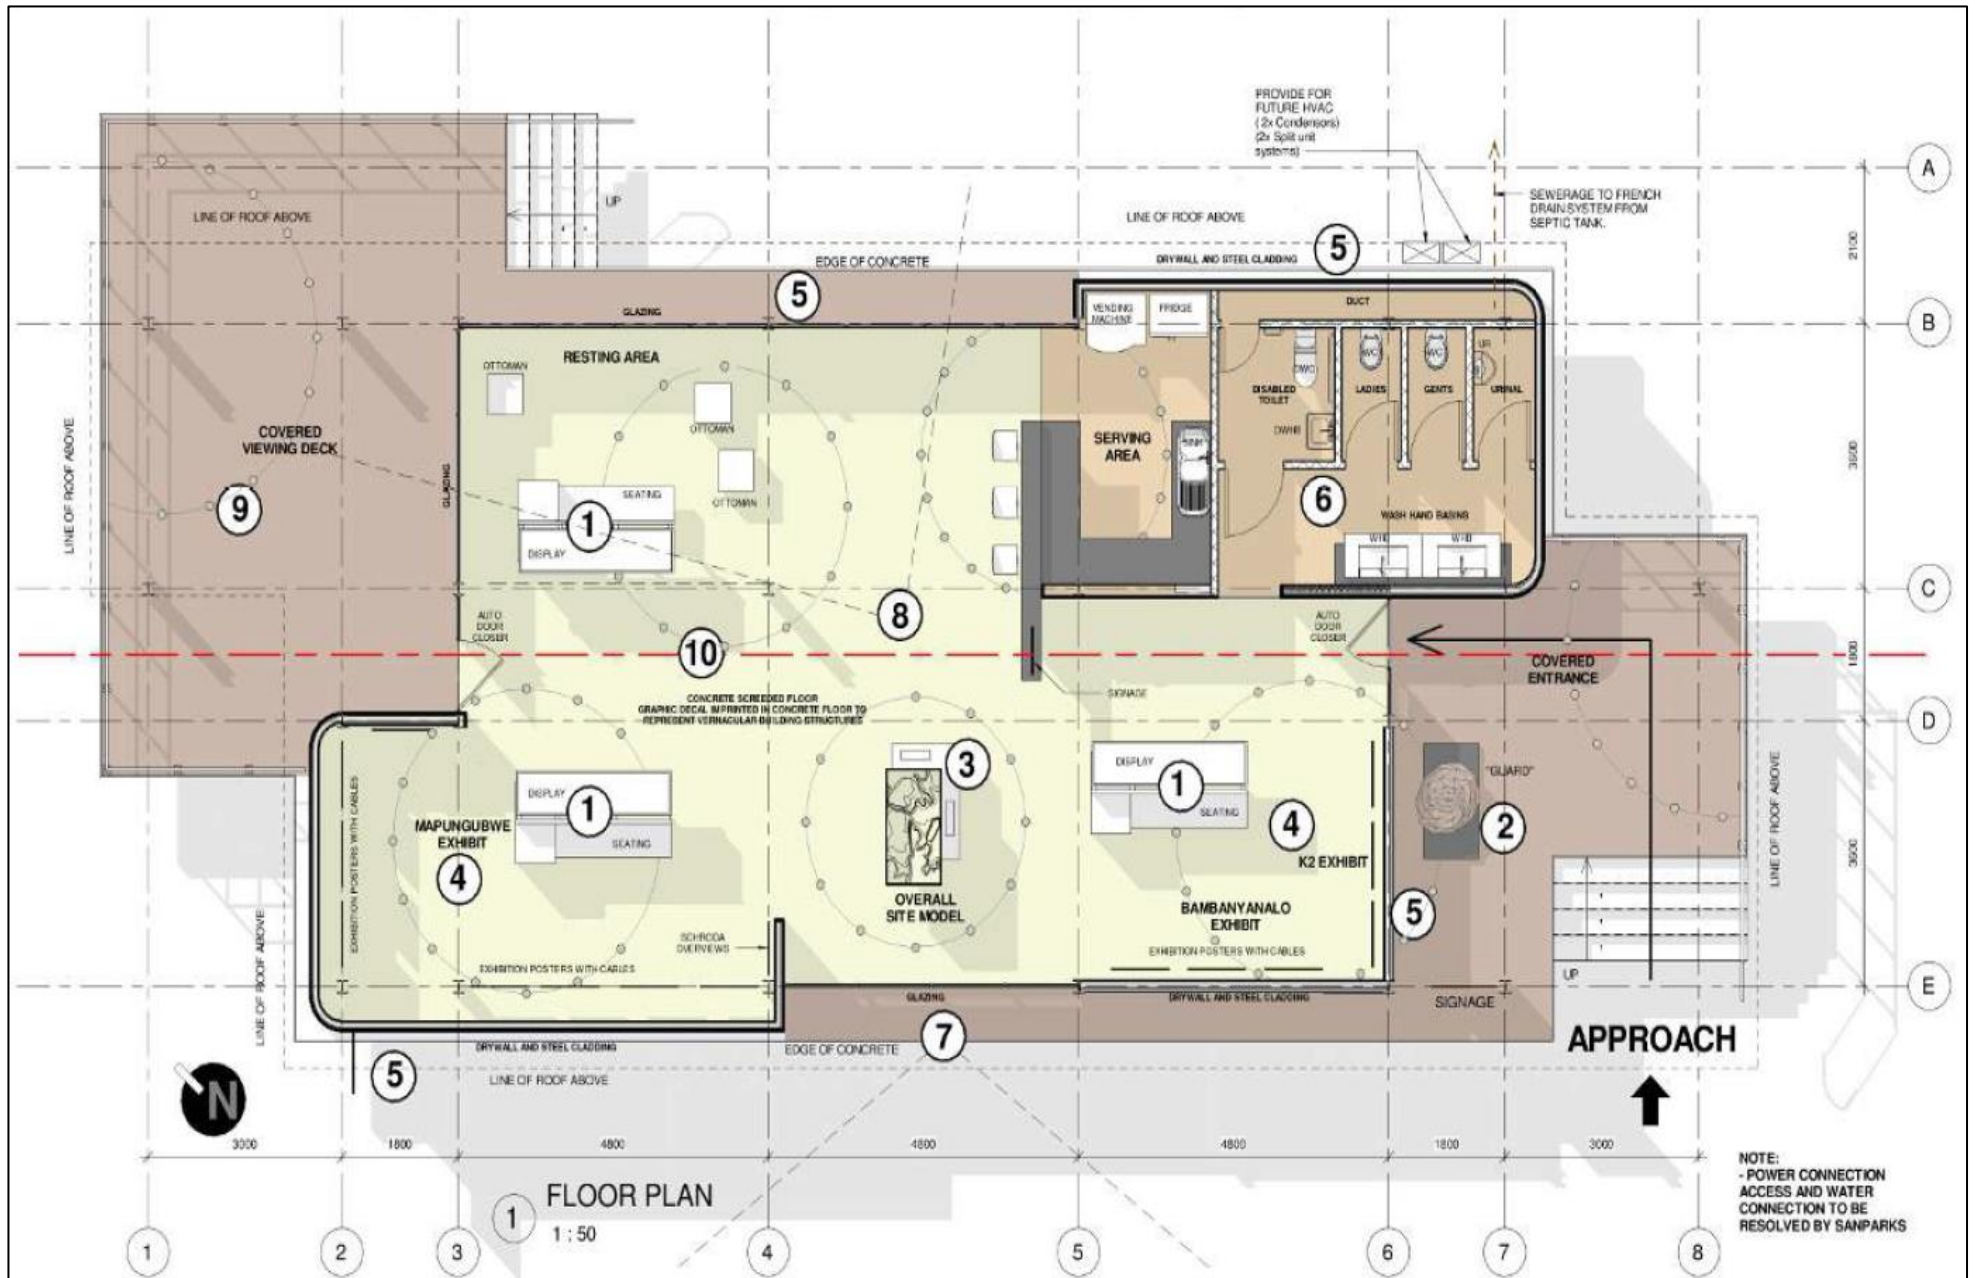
Building Plans for the Proposed Orientation Centres at Mapungubwe Hill and Schroda.
